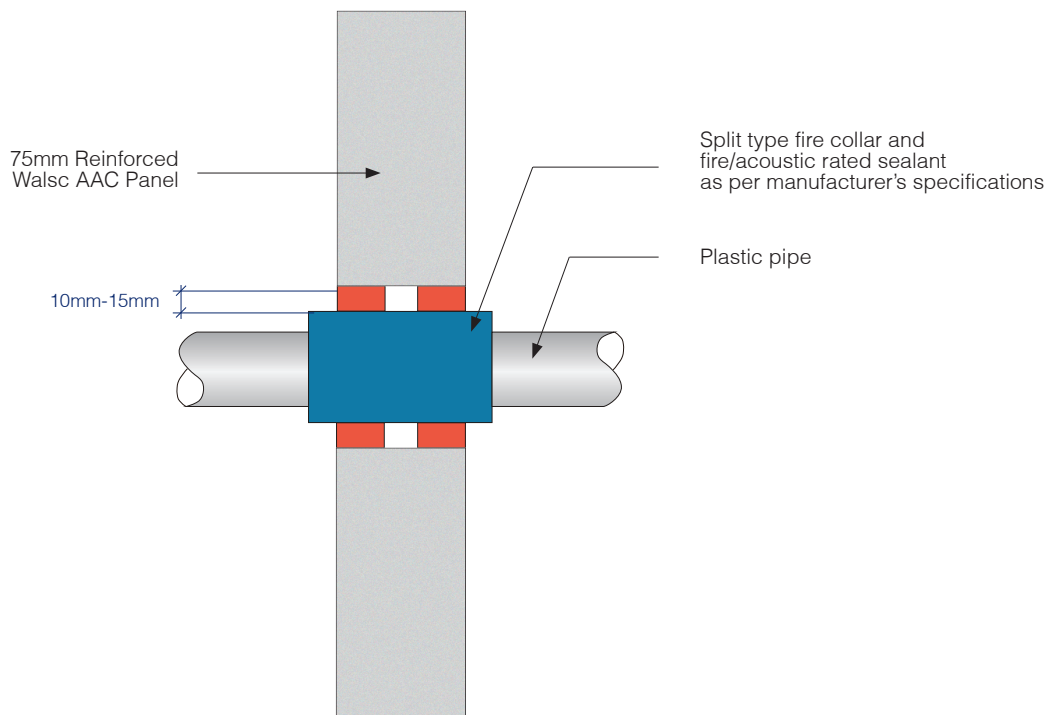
Plastic Pipe Penetration with Split Type Fire Collar Detail
